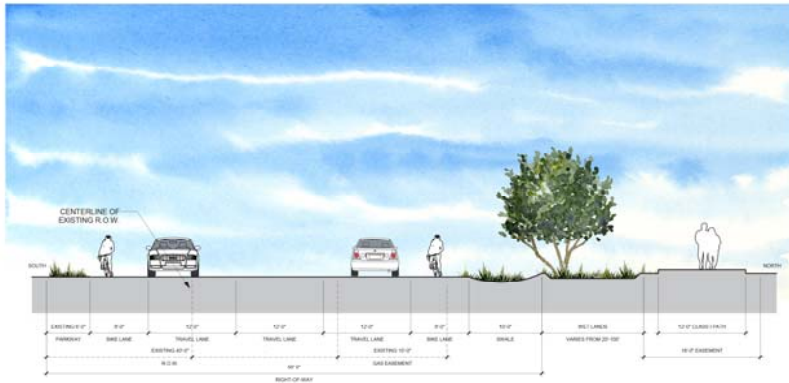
Arterial – Typical Buckley Road Cross-section in Developed Areas
